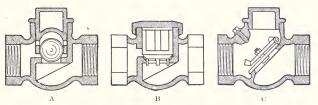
Types of Check-Valves. A-Ball-Valve; B-Flat Valve; C-Swinging Check-Valve.
